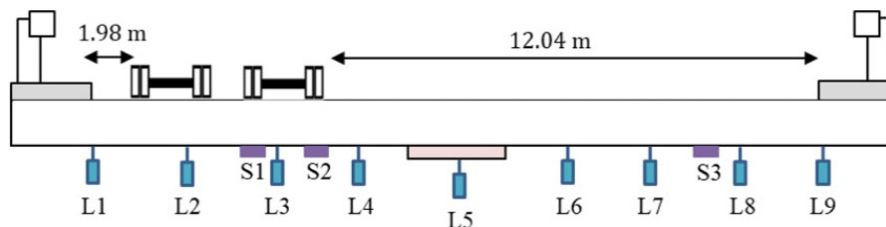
Illustration. Critical loading path (path 2) in the proof load test of Kickapoo bridge.
